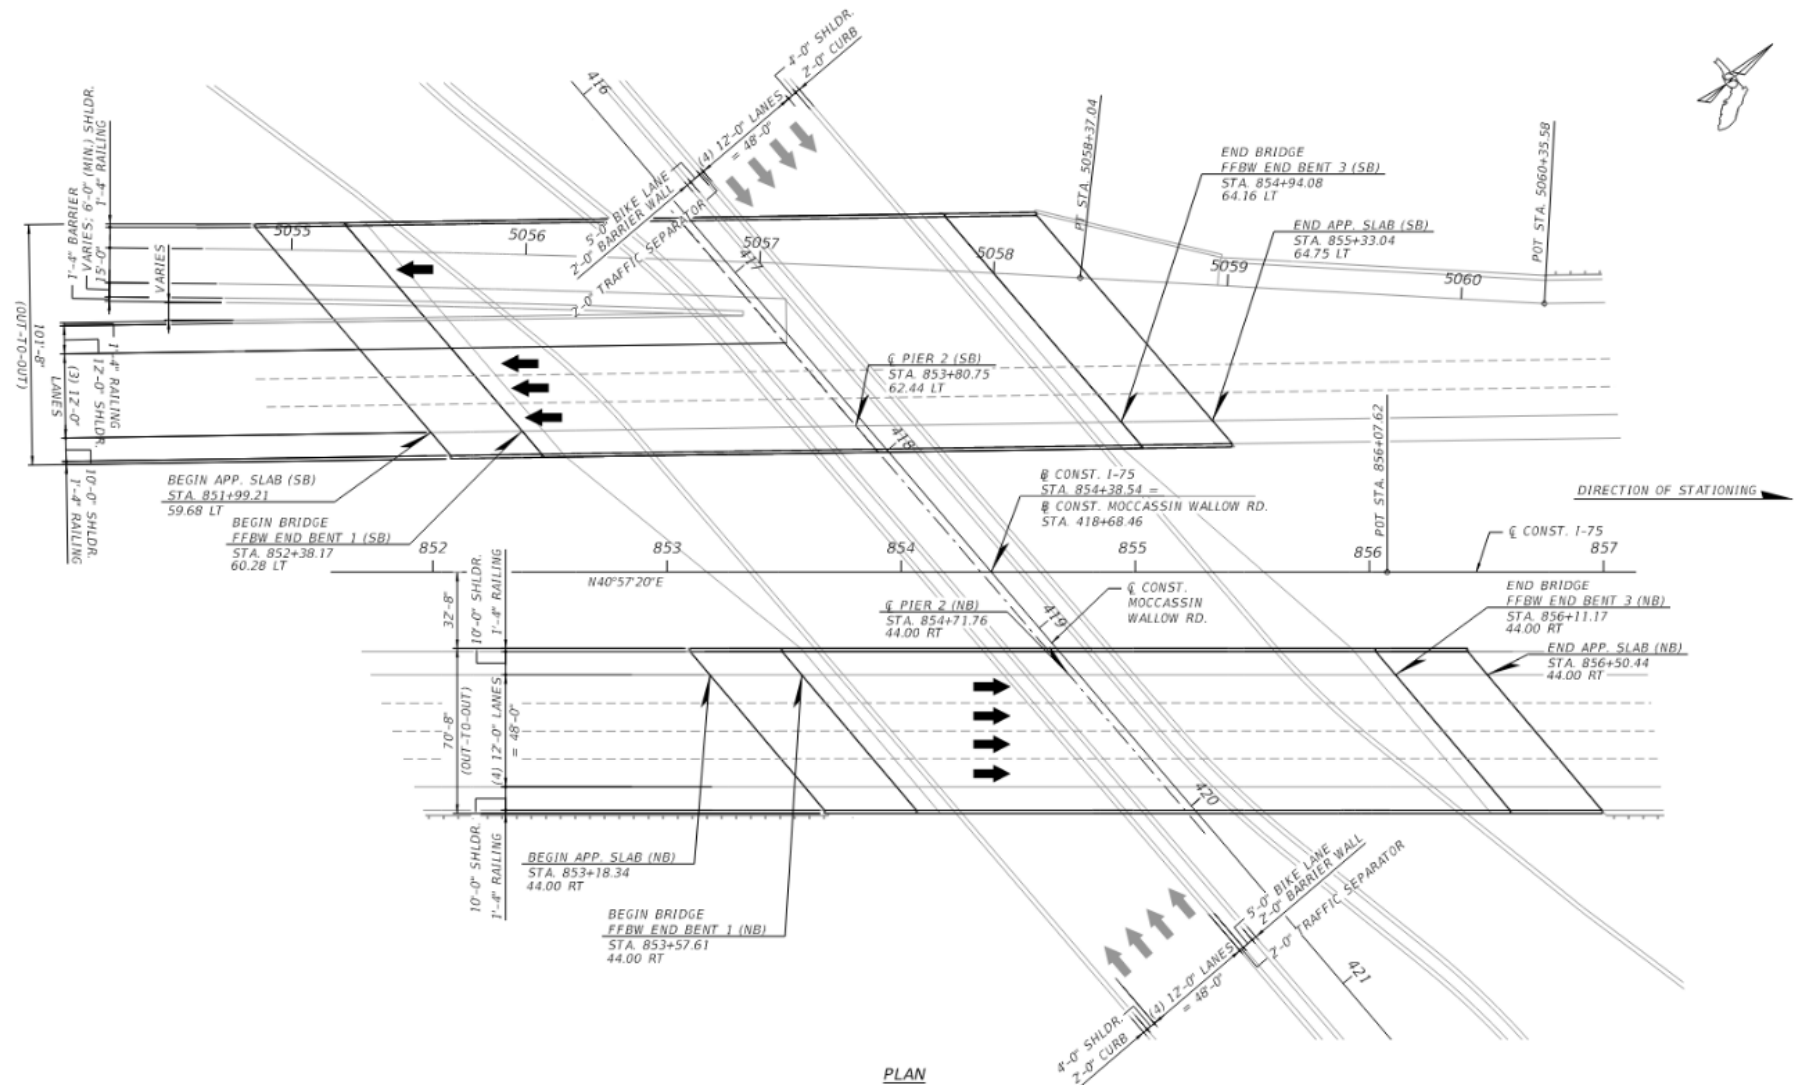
Proposed Northbound and Southbound I-75 over Moccasin Wallow Road Bridges Horizontal Geometry
